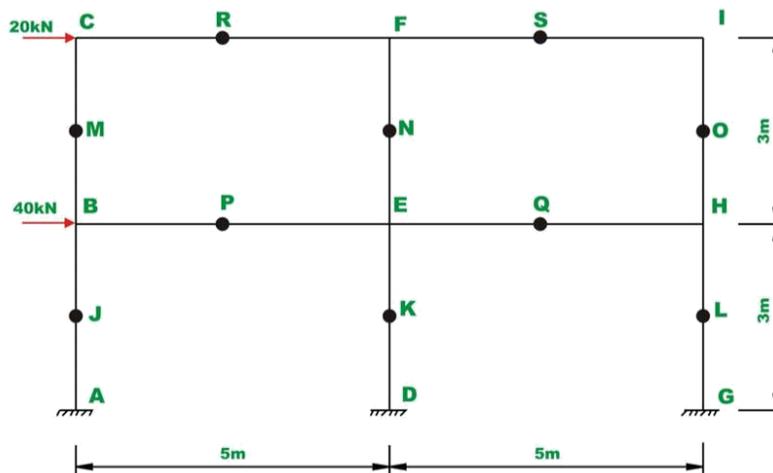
Two storey building frame subjected to lateral load of Example 36.2
